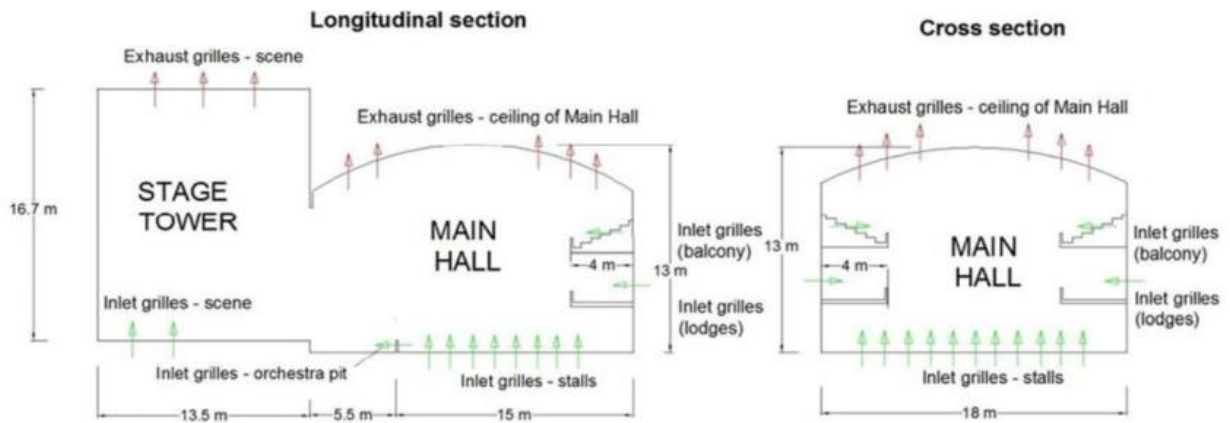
5 Longitudinal section and cross-section of the building. (George, 2016)
